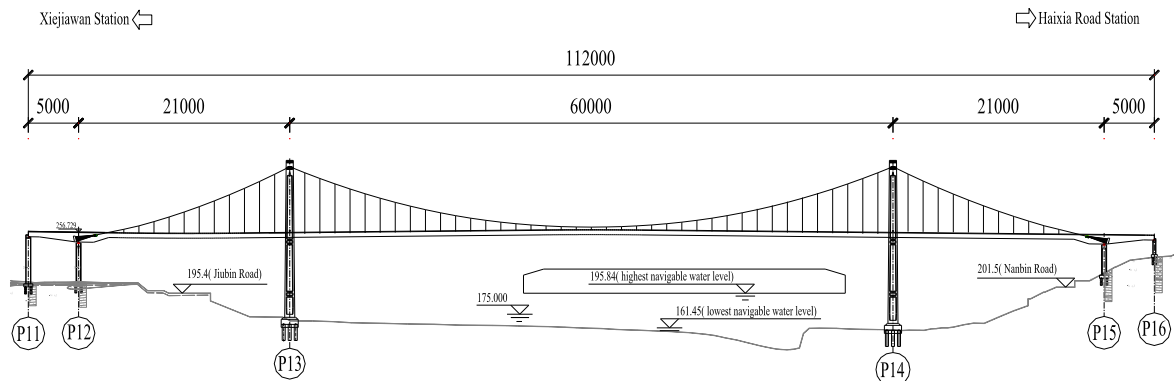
Span arrangement of Urban Rail Transit Egongyan Bridge
